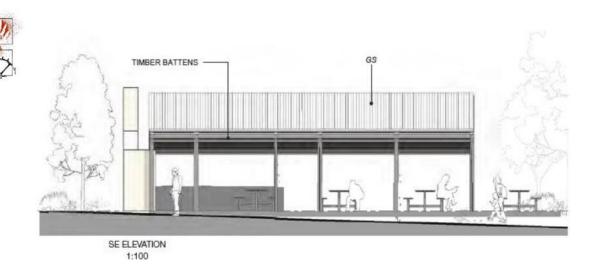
Elevation of proposed new Sports Pavilion reusing the existing bread oven and fireplace from the Cook House.
